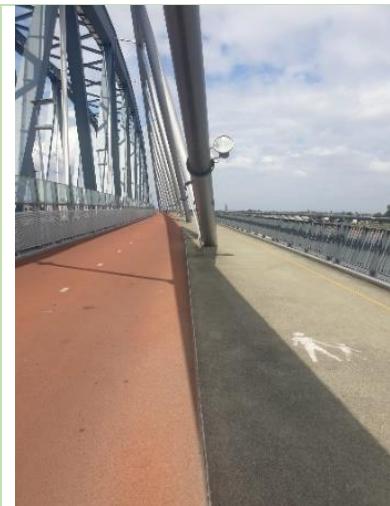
Bridge 'De Oversteek' with its piles located on the sidewalk
